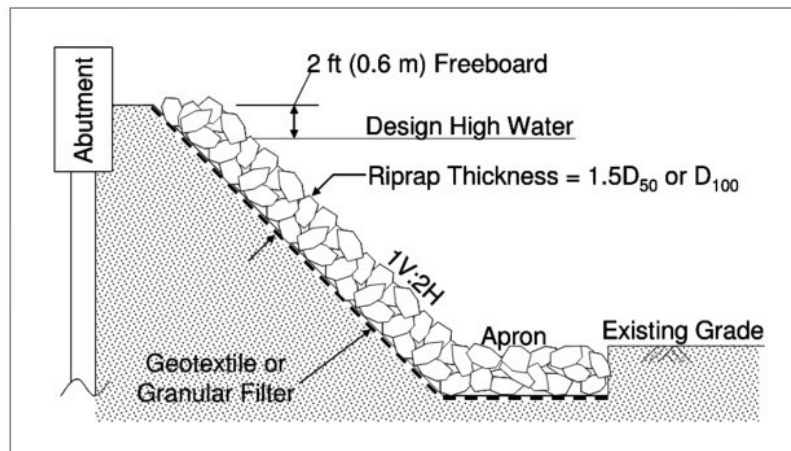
Typical cross section for abutment riprap (Lagasse et al. 2006).
